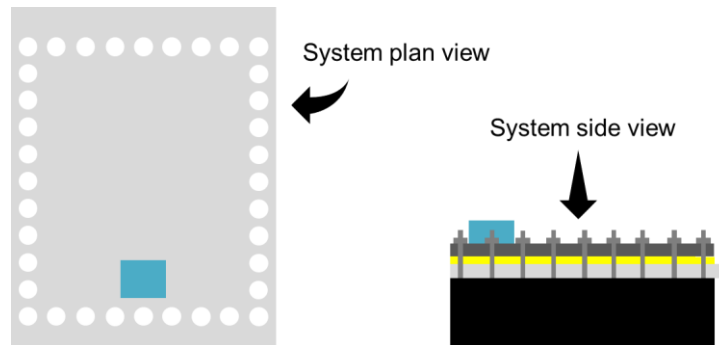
The sensor placement for shear box testing, where the sensor is represented by a blue rectangle. (left) plan view. (right) side view.
